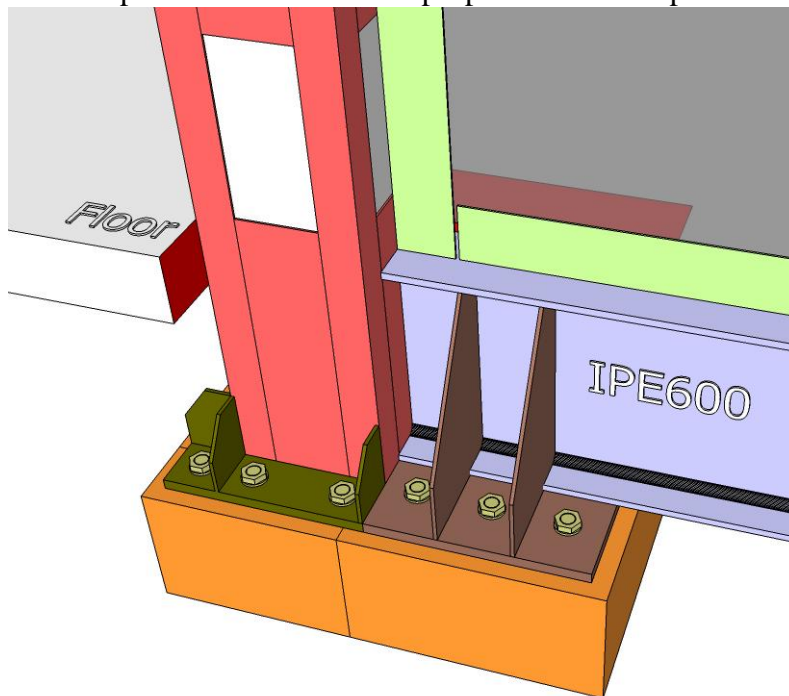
Proposed solution principle for enhancing concrete column base and base beam connection.
